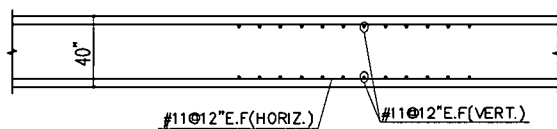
Typical Reinforcement in South interior Wall – SECTION 2
